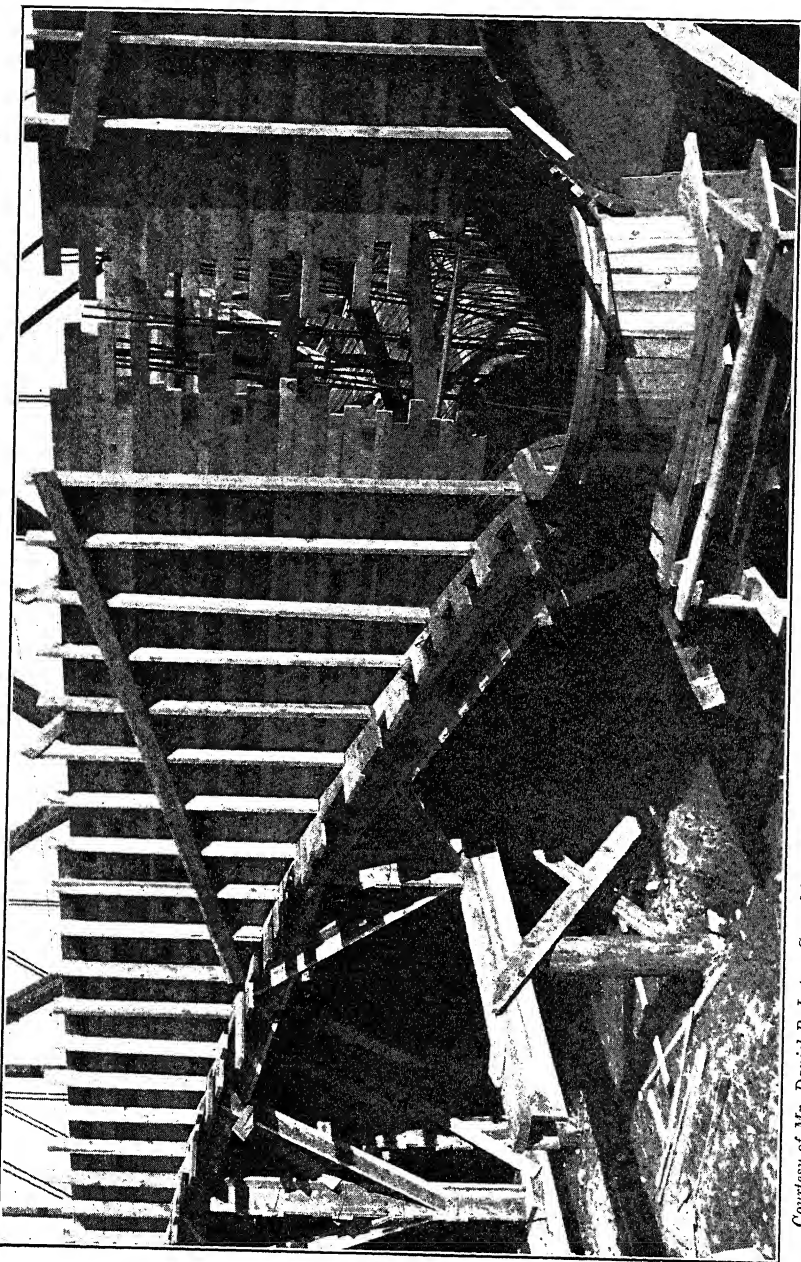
Typical pier forms used in bridges of Luten Design.
